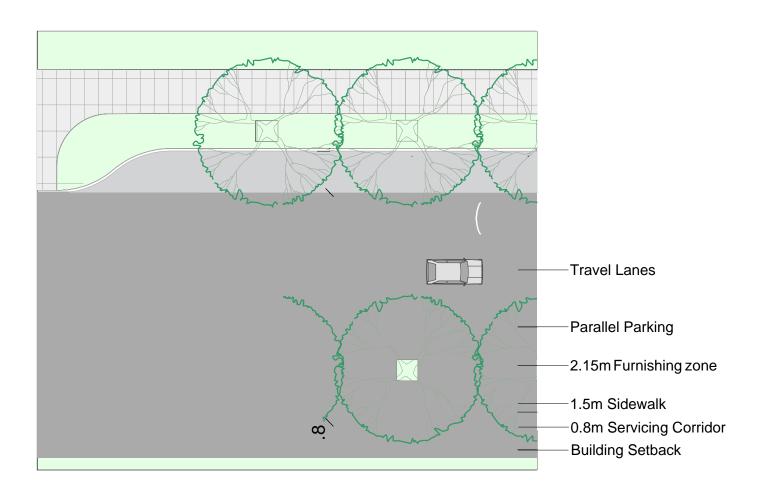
Typical Plan for all other streets in the Neighbourhood Core Development Permit Area
